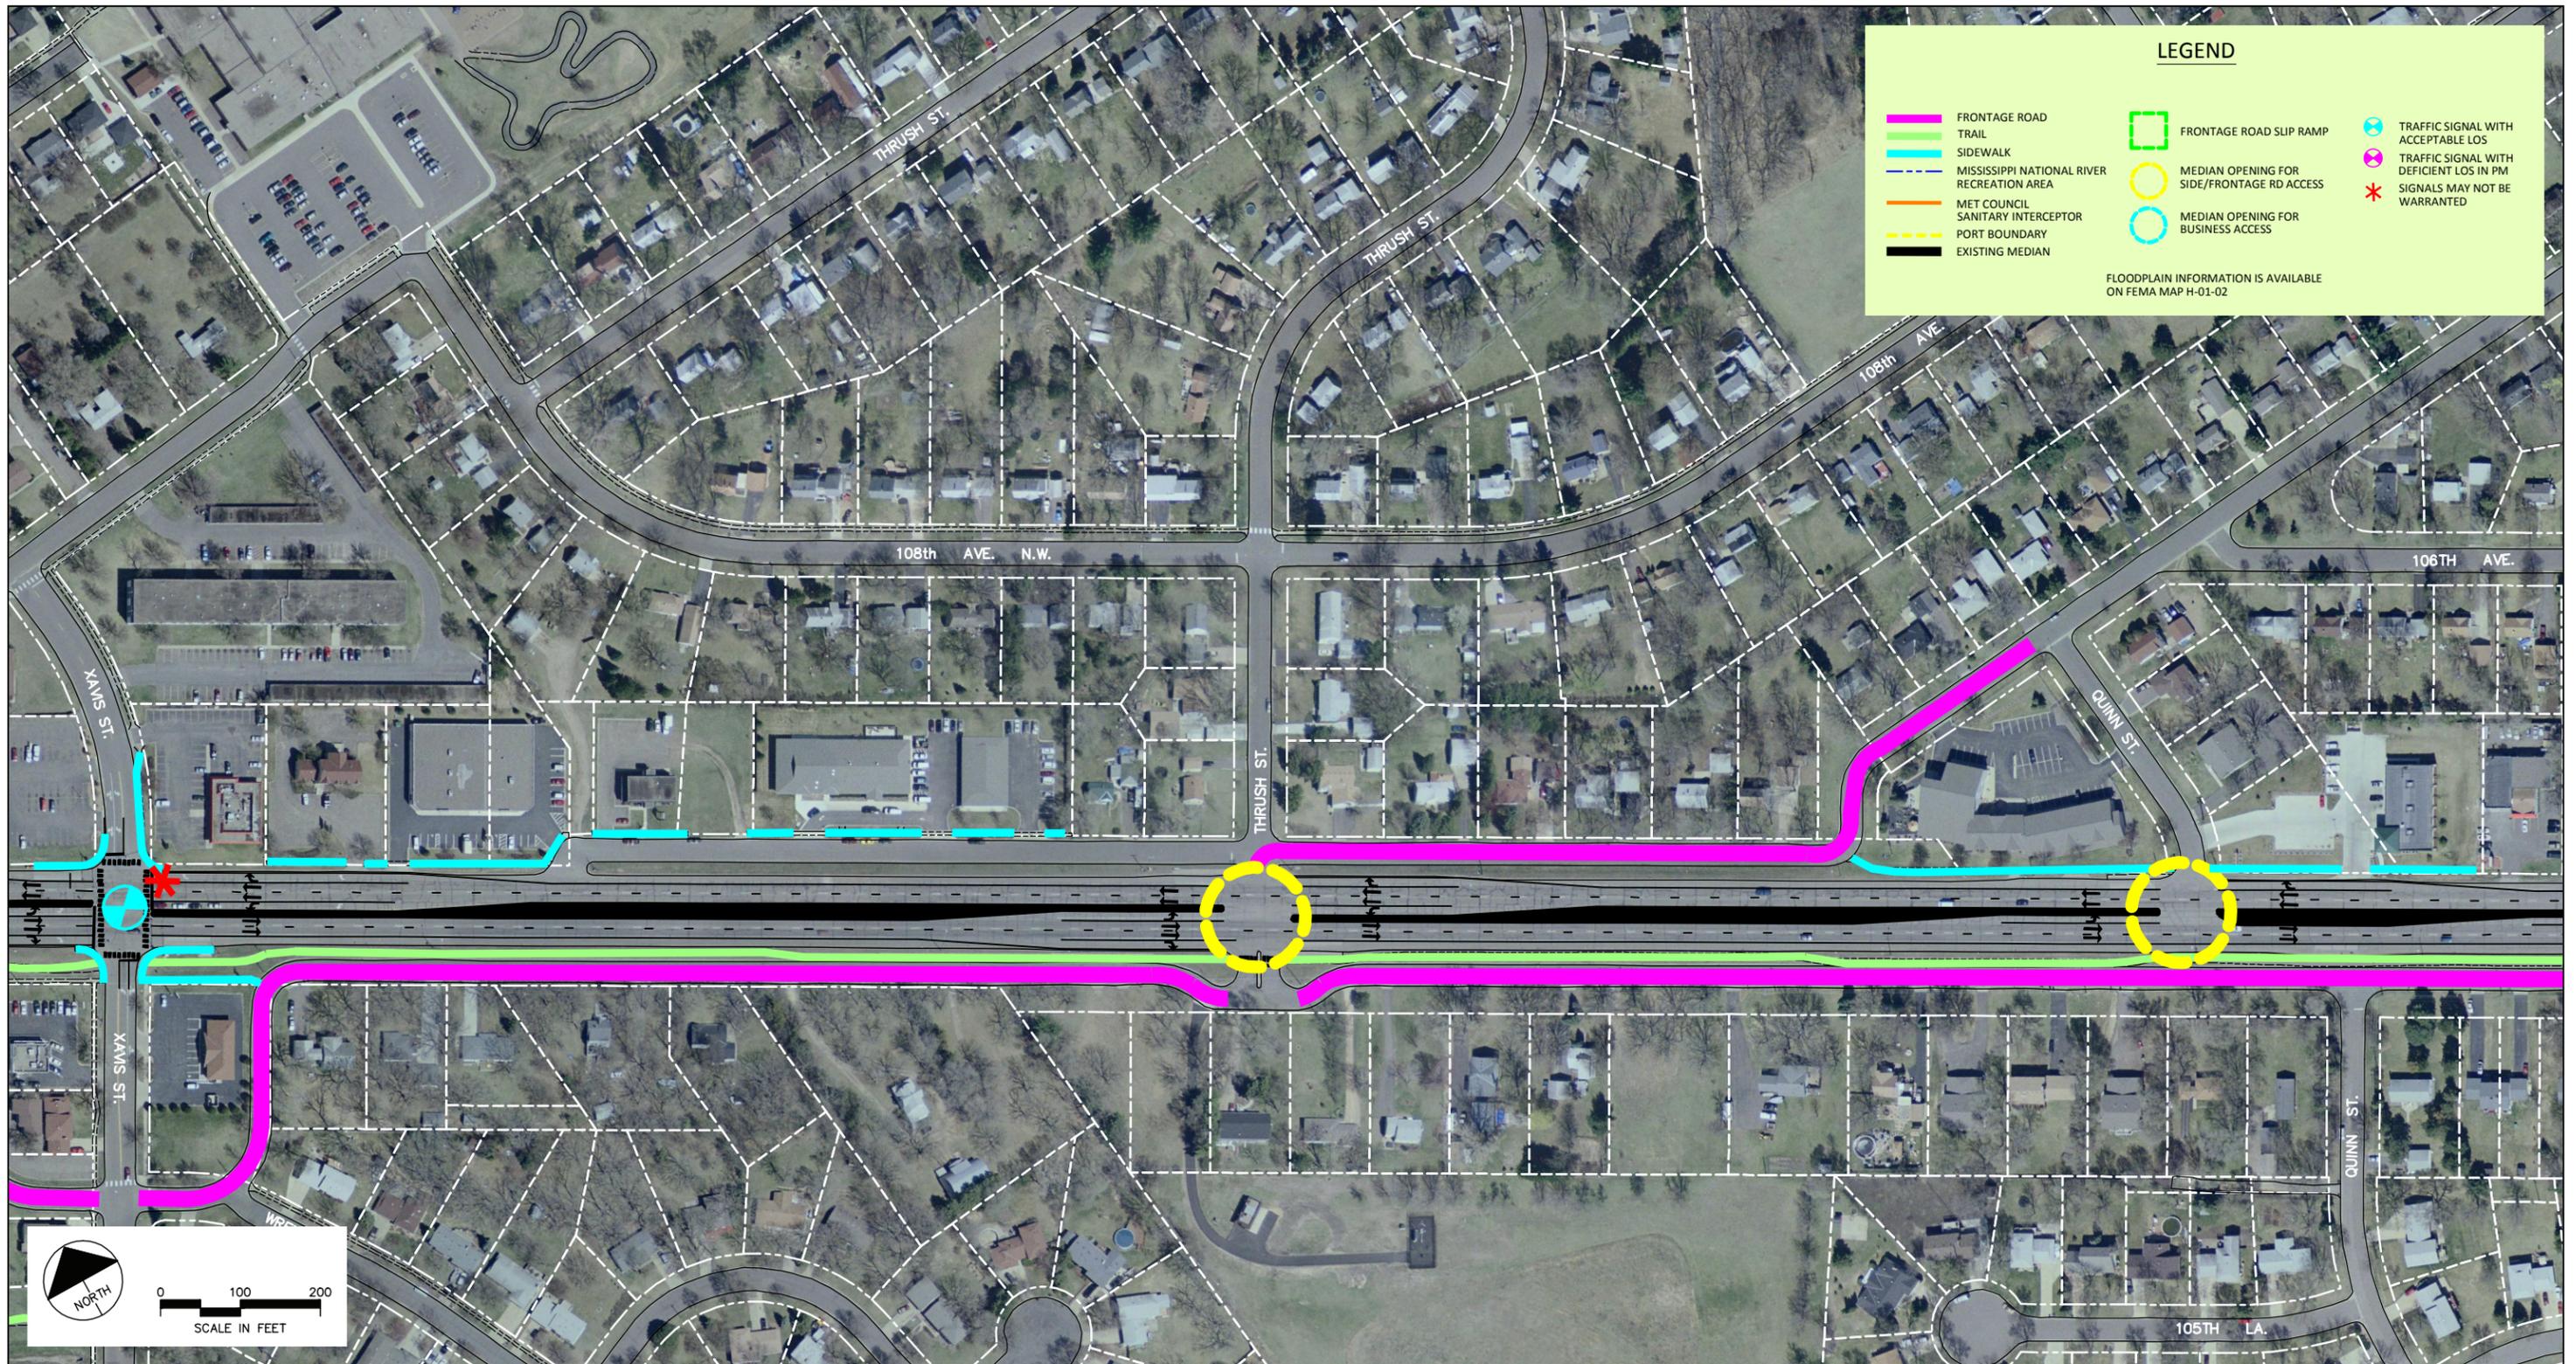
Existing Roadway Features (7 of 15)
